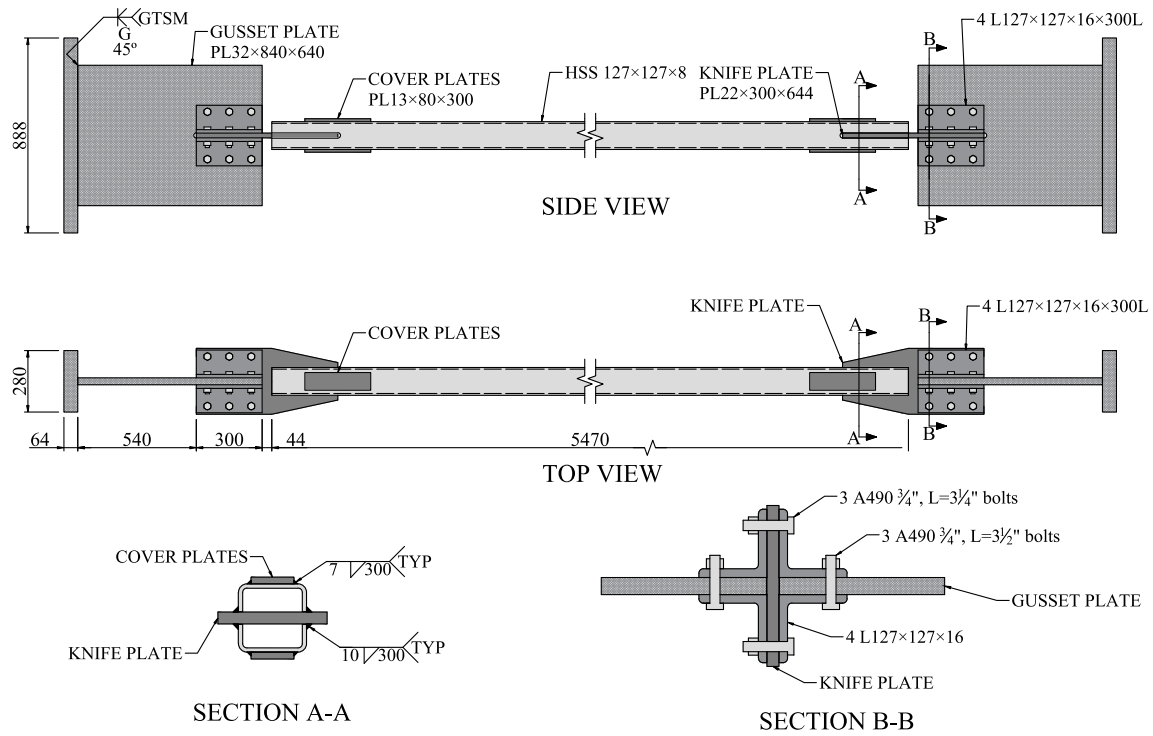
Specimen 1 – HSS 127×127×8 CLB (dimensions in mm)
